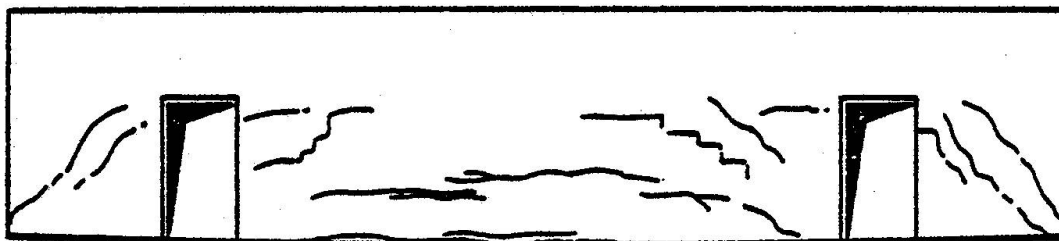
Significant cracks in a masonry partition supported by a flexed beam
